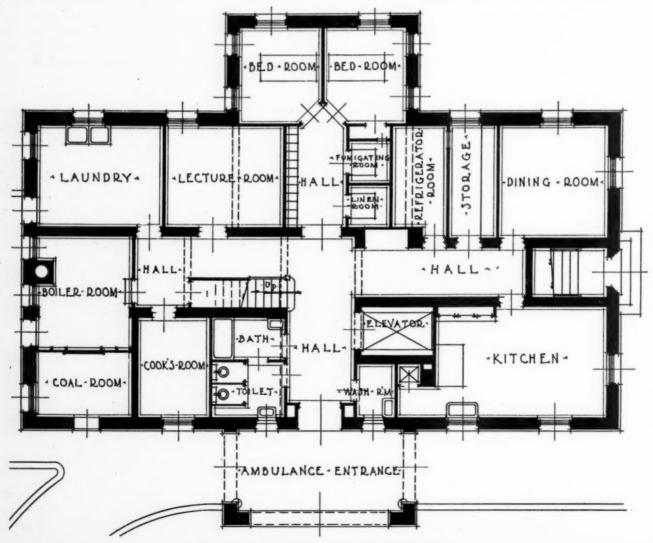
King's Daughters' Hospital—Ground floor plan.
